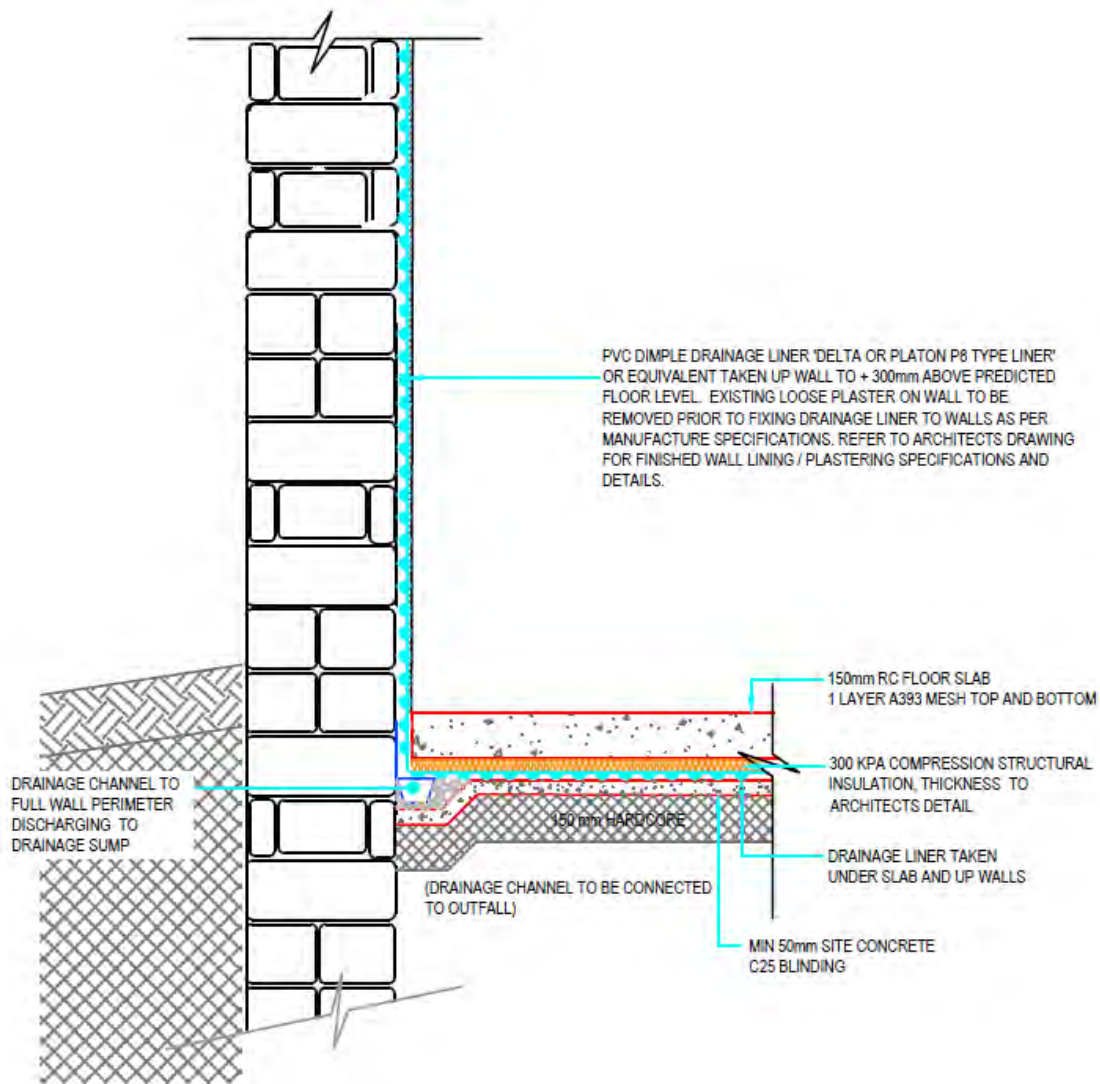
Typical Internal Drainage Liner Flood Resilient Detail to External Walls
